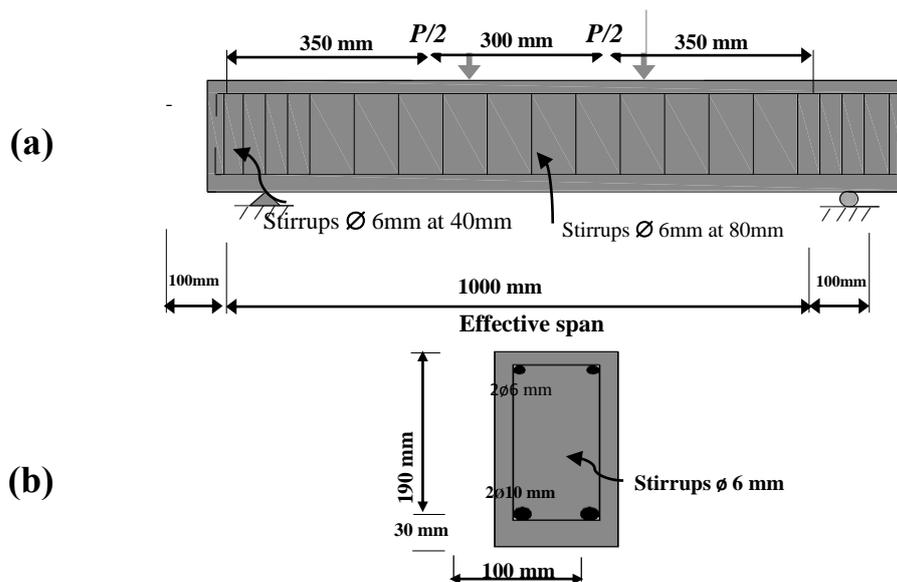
Beam dimensions and steel reinforcement details: (a) longitudinal section; (b) beam cross section
